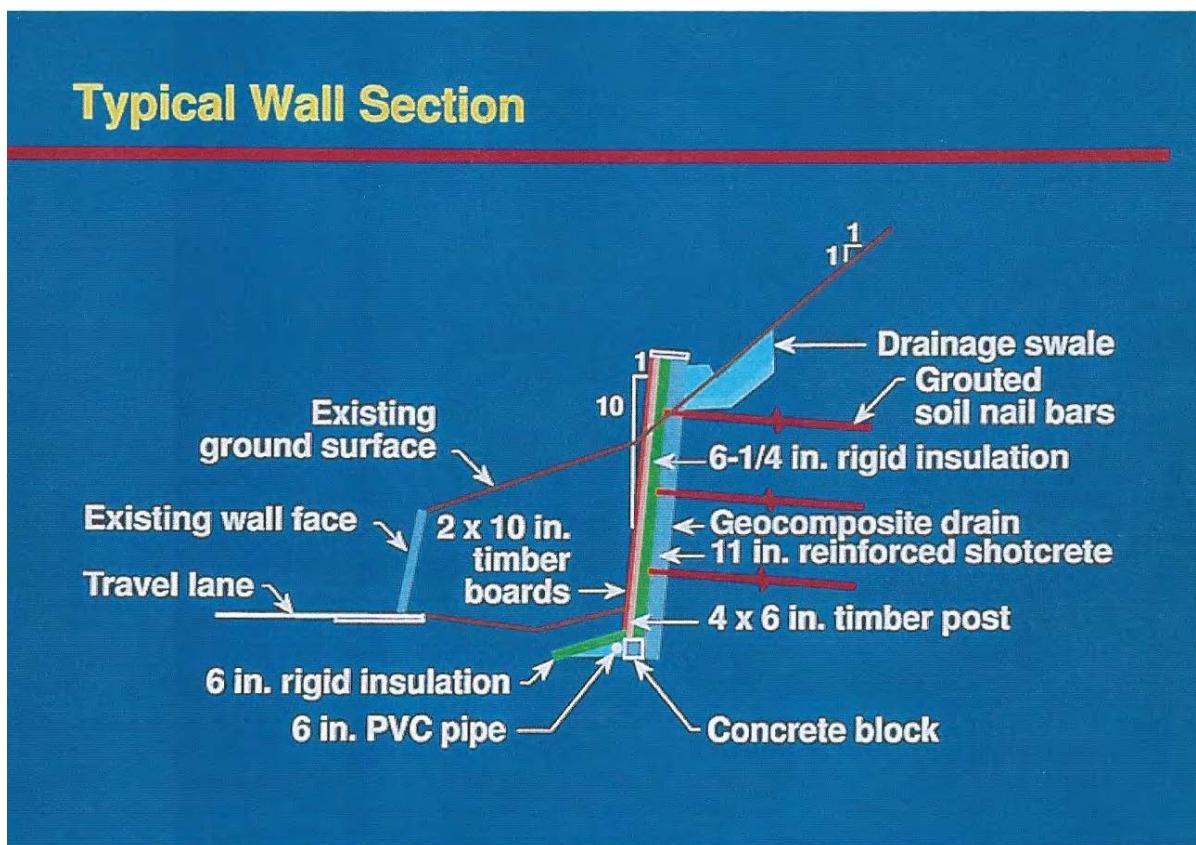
Typical soil nail wall section (Haley & Aldrich, 1997)
